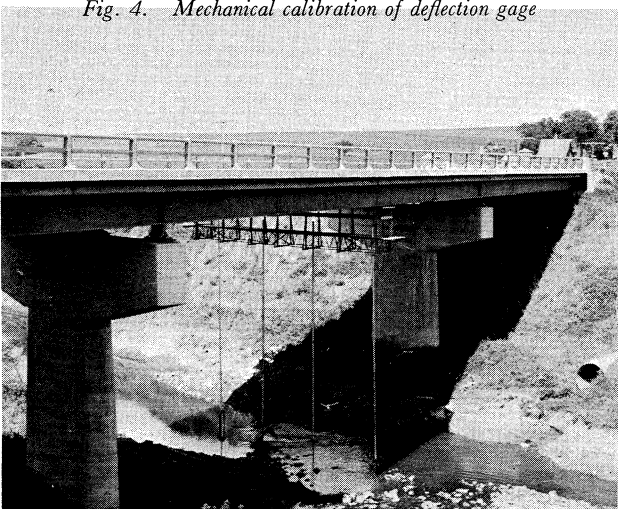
Bridge, showing falsework erected for installing deflection gages
